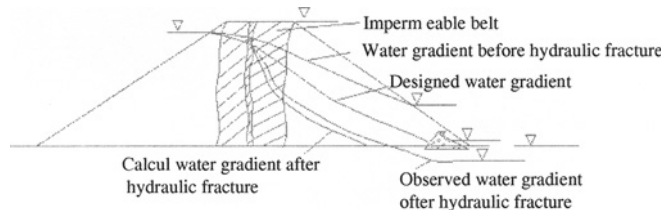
Alteration of the saturated line aftergrouting and before grouting
